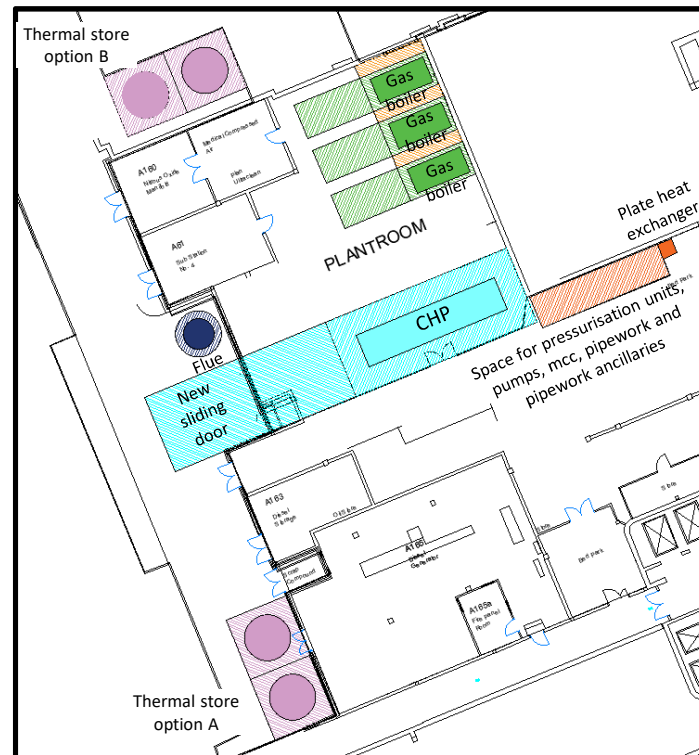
CHP in ECC – existing hospital plantroom
